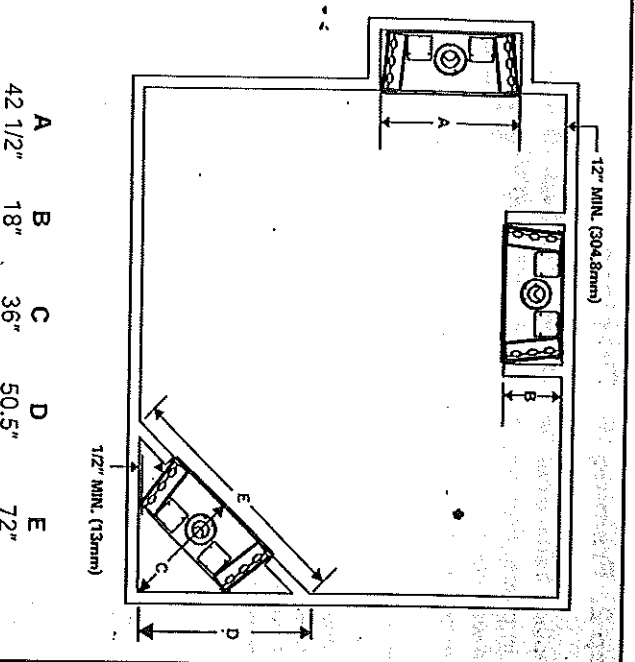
Fireplace Dimensions, Locations, and Space Requirements.
